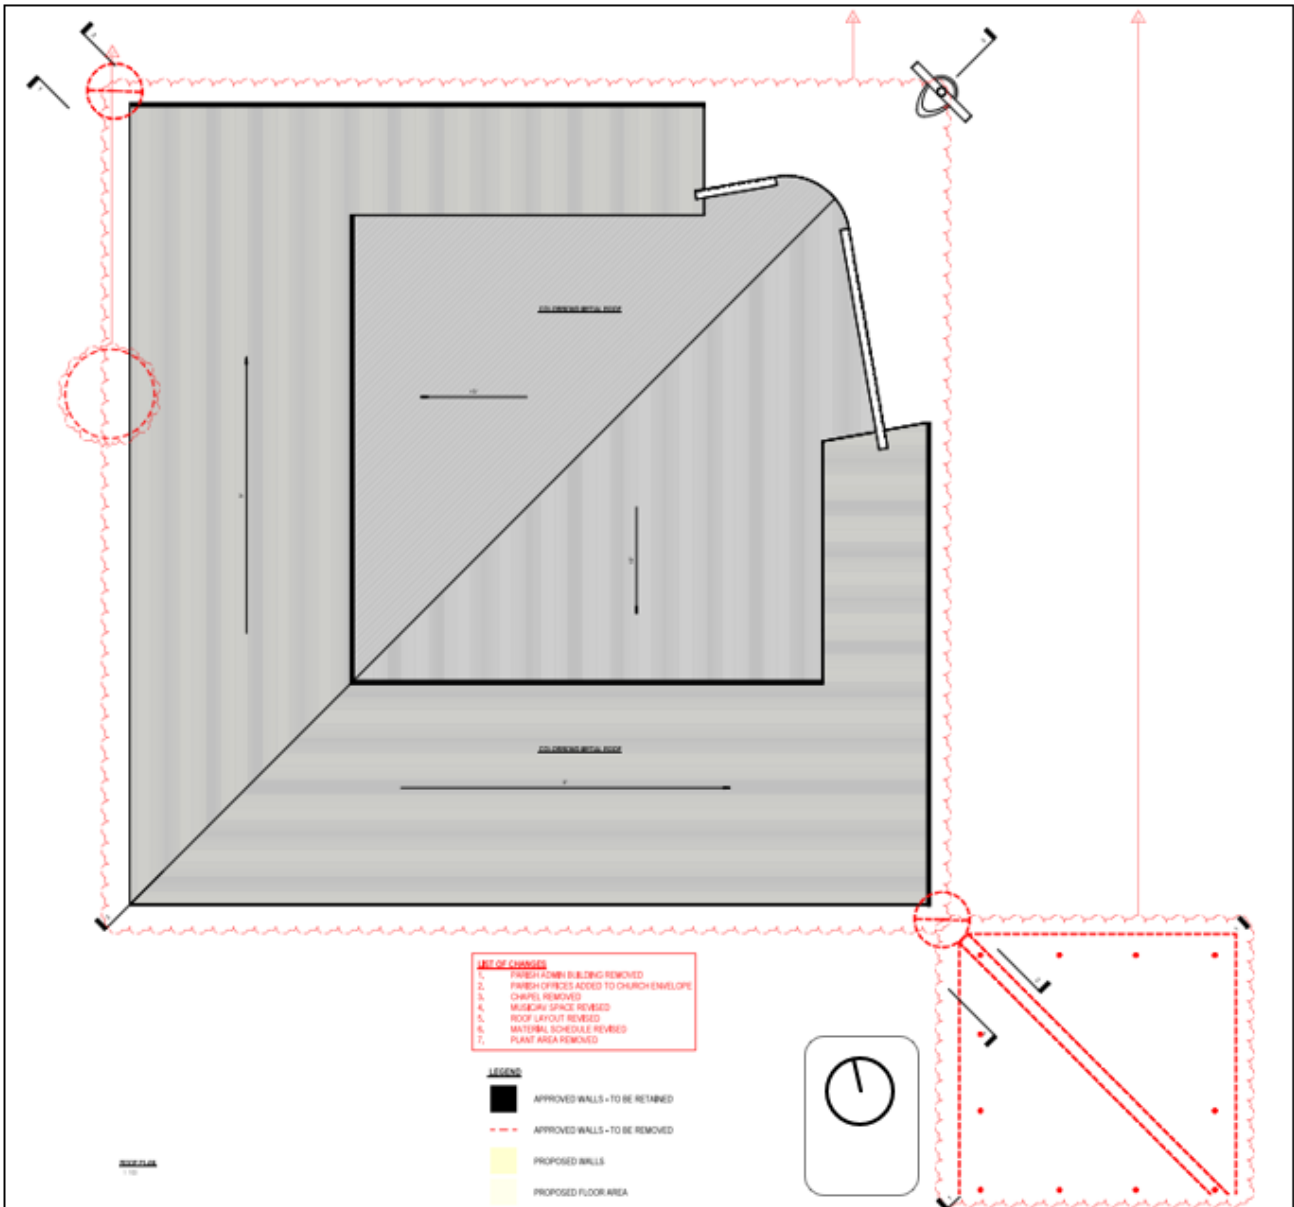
| Proposed roof layout (Source: Applicant’s Modification Application, 2026)
